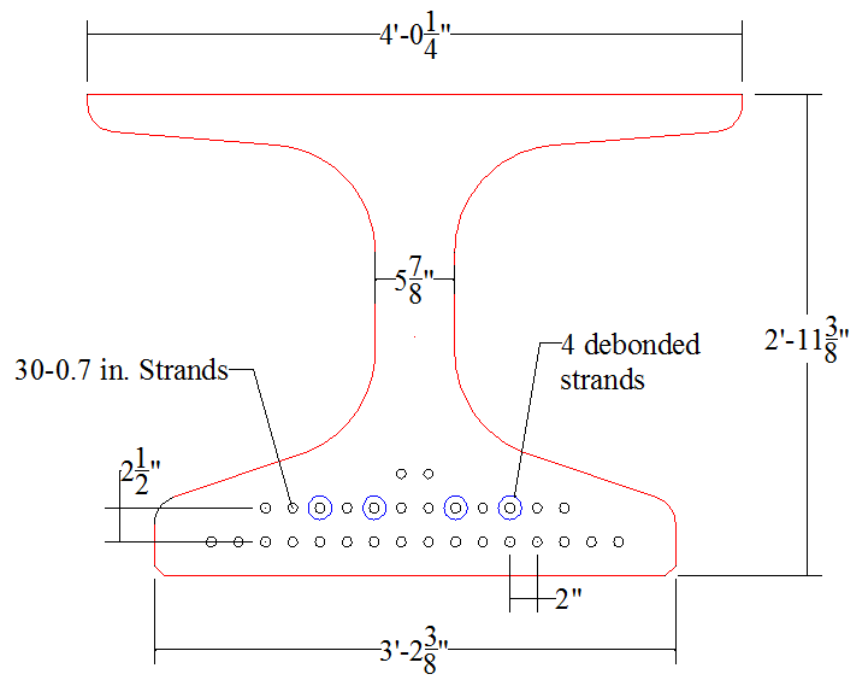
Cross section of NU900 used in the Pacific Street Bridge
